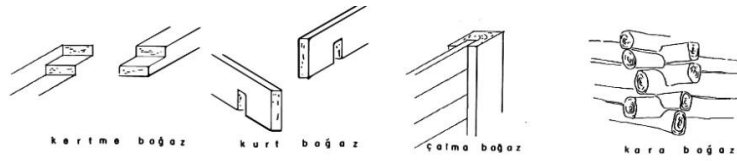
Types of wooden masonry throat joints (Özgüner, 1970)
